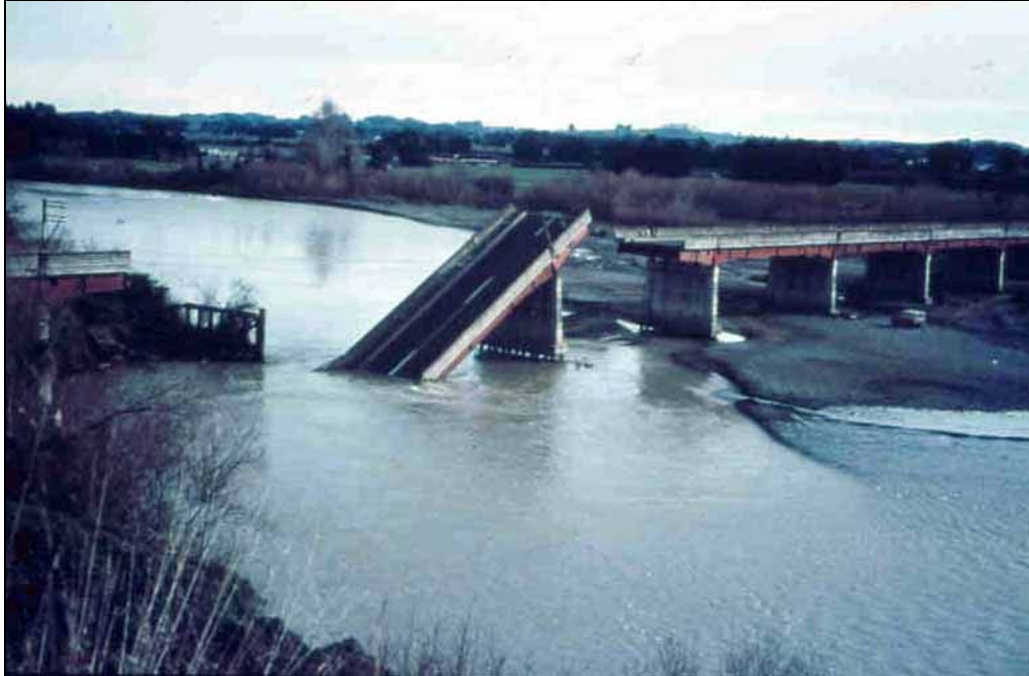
Pier scour and failure, Bulls River, New Zealand; The poor alignment of the bridge relative to the left bank caused adverse velocities at the failed pier
